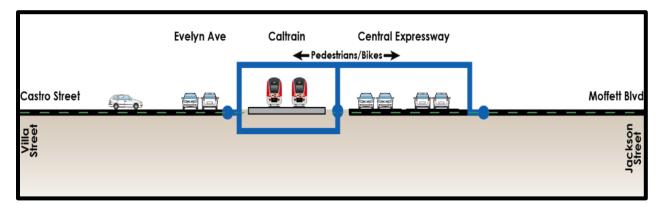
Alternative 4: Close Castro Street at the Railroad Tracks
